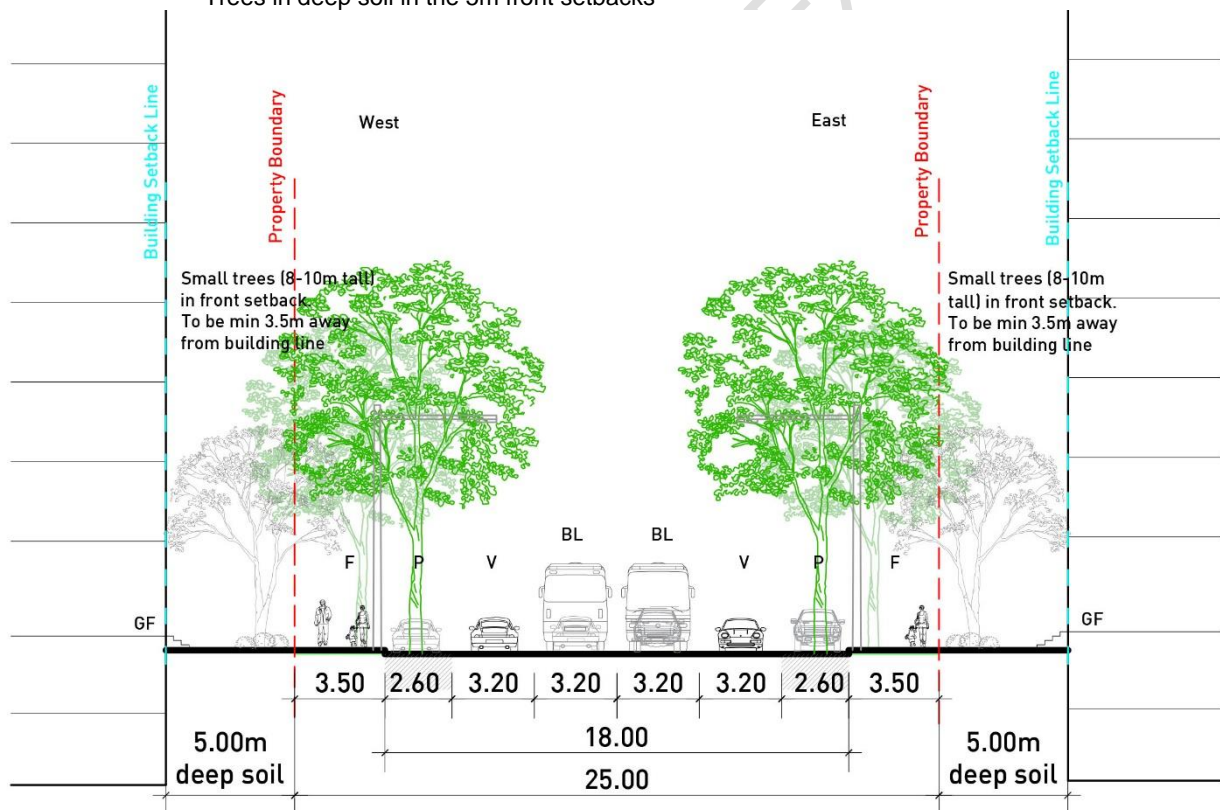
Type 1 Major Road / Boulevard Building to Building (NSR 2)
